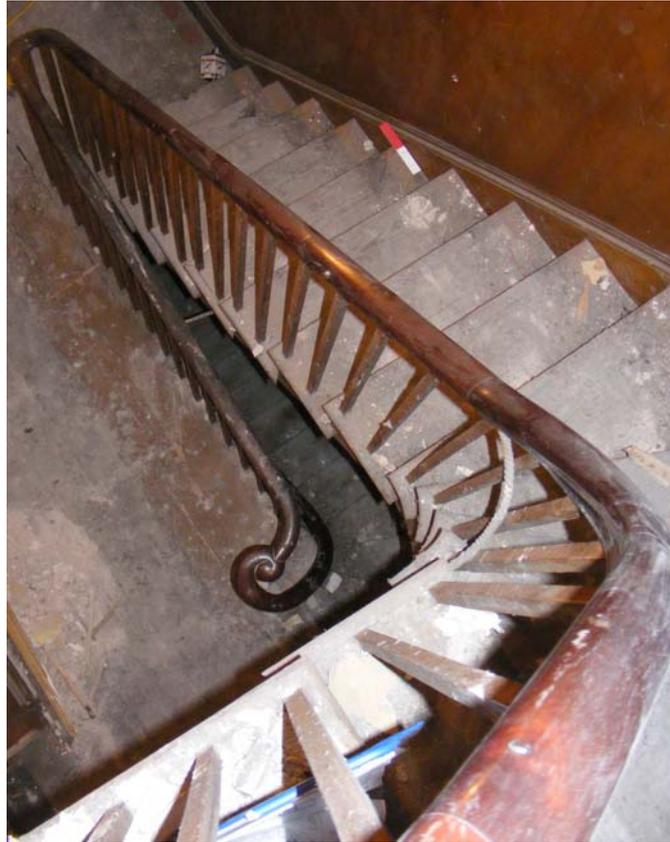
Main Staircase in 46 King Street from 2nd floor landing
